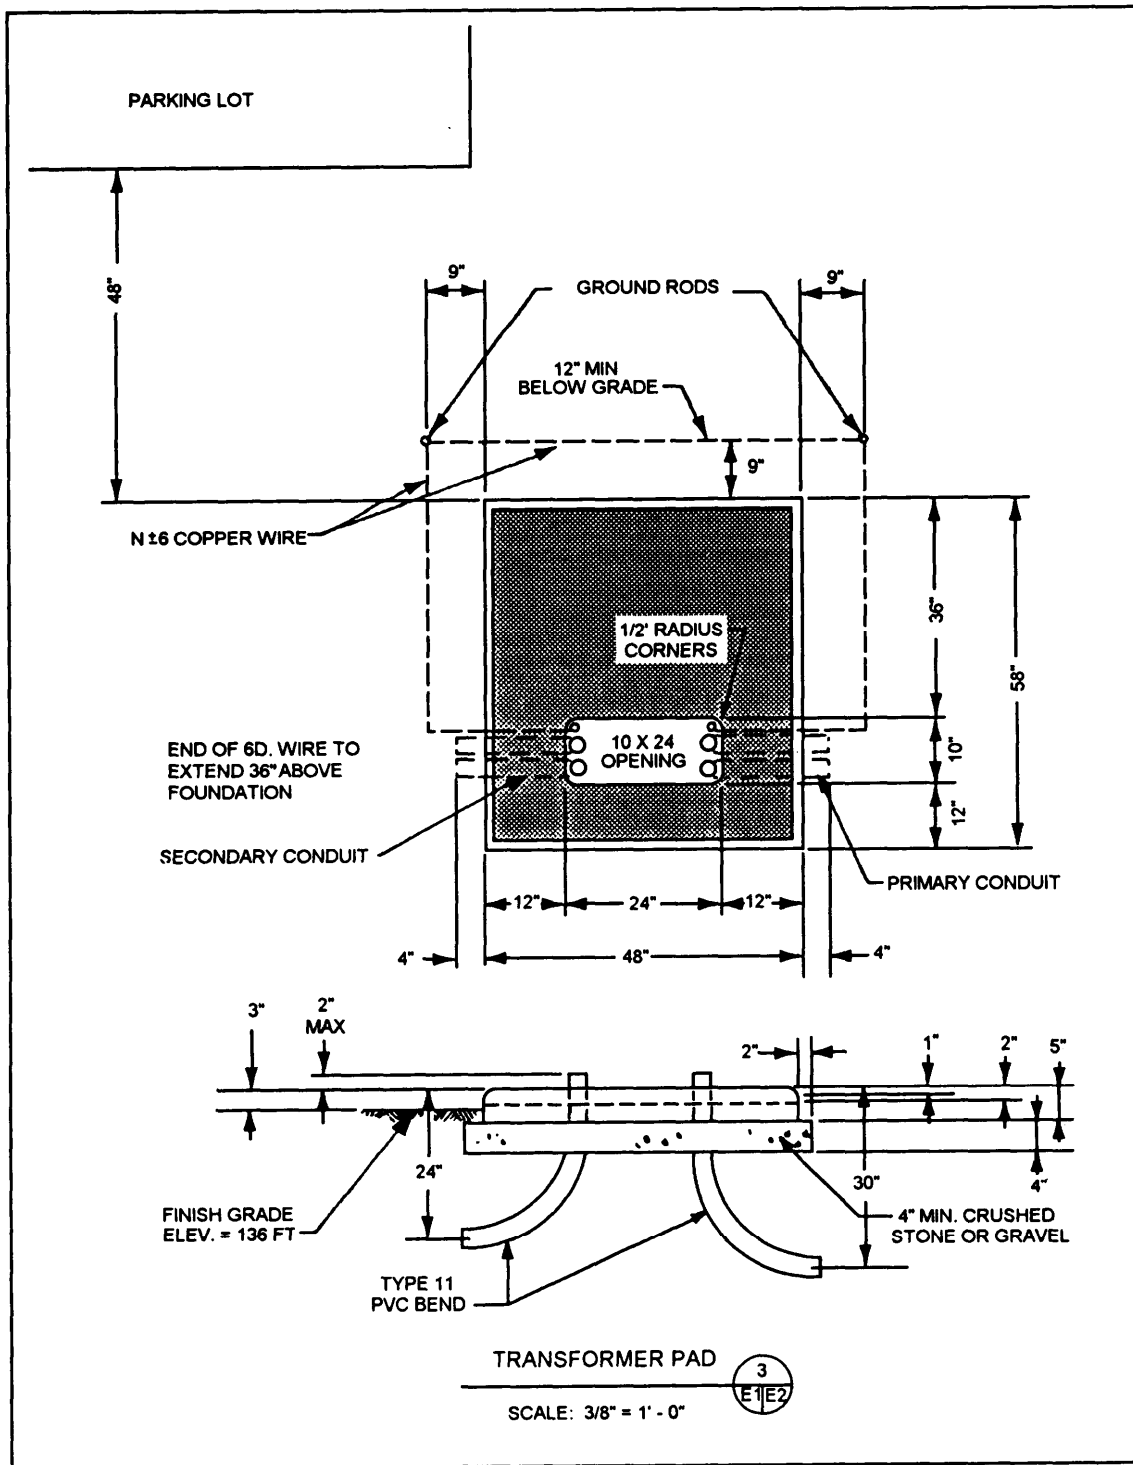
Transformer pad details for use with the site plan shown in figure 2-15.
